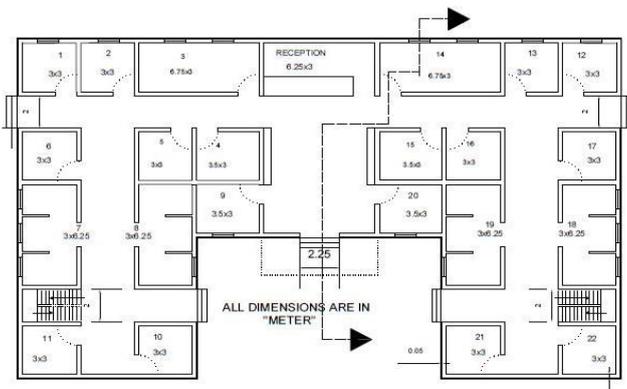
; Plan of six- story RC building (all dimensions are in mm)
